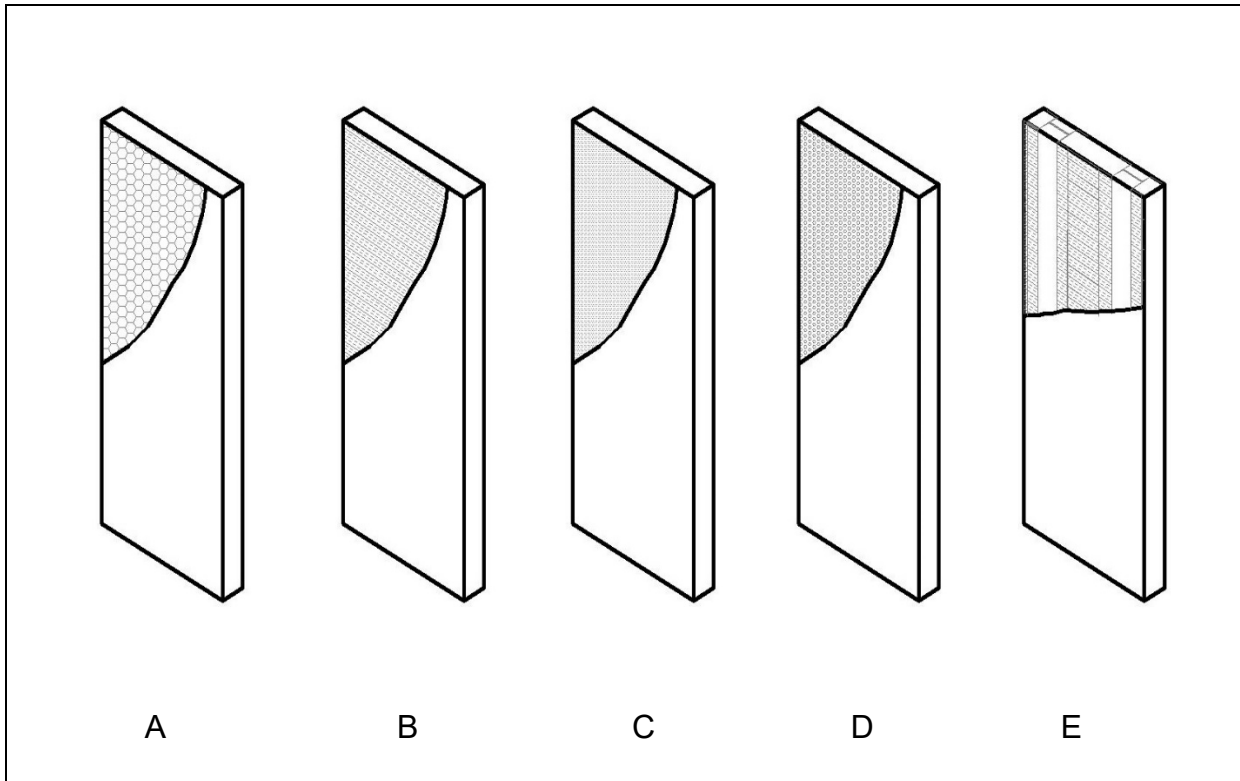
TYPICAL INFILL MATERIAL FOR DOOR SHUTTER.
